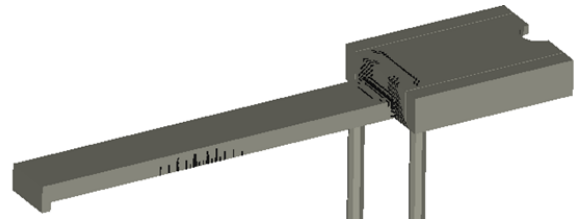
Cracks in a single-hinged footbridge, the critical section is at the centre of the footbridge span.
